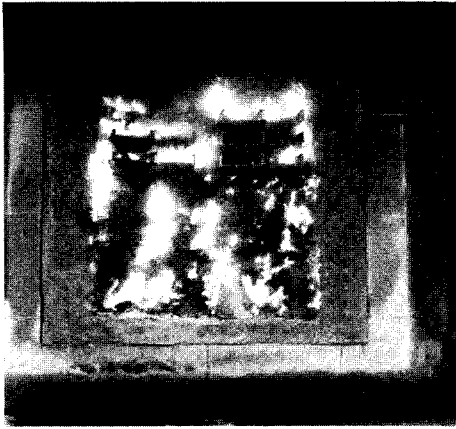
Photograph of Ongoing Fire Test (Specimen 1).
